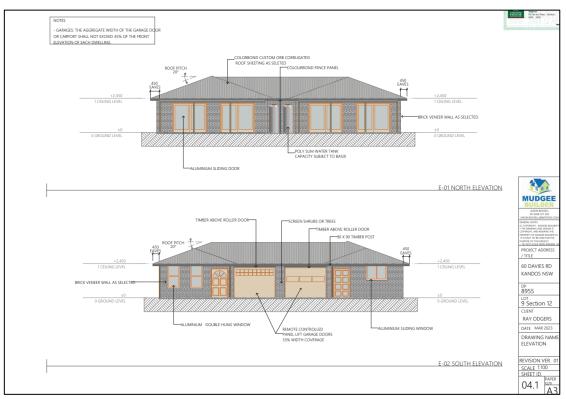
Proposed north and south elevations (source: Mudgee Builder)
